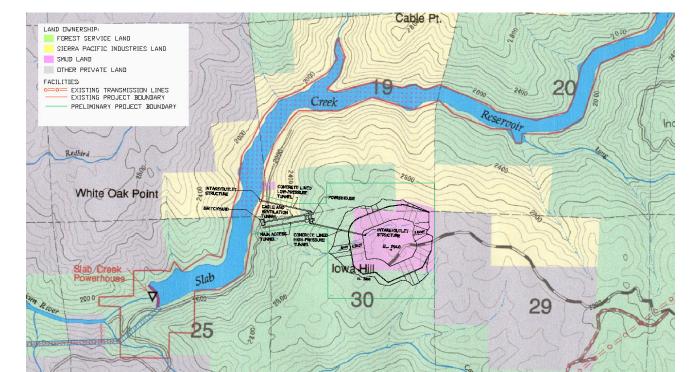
Plan View of the Proposed Iowa Hill Development
